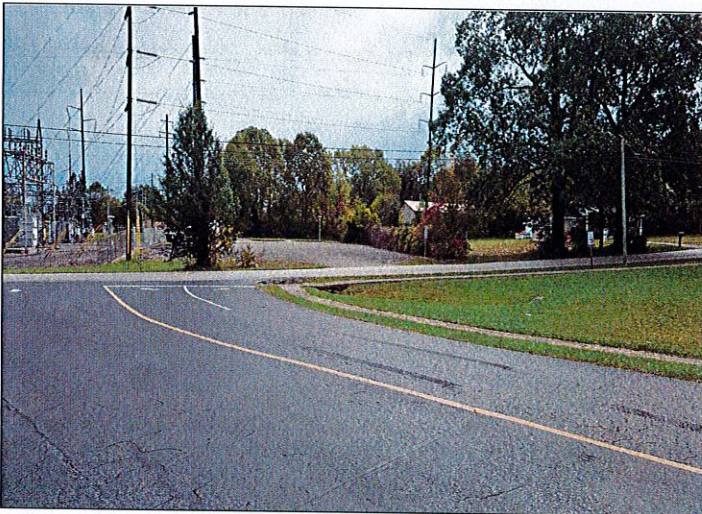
View of the proposed right of way, looking north from the existing right of way at the corner of West College Avenue and Halls Lane
